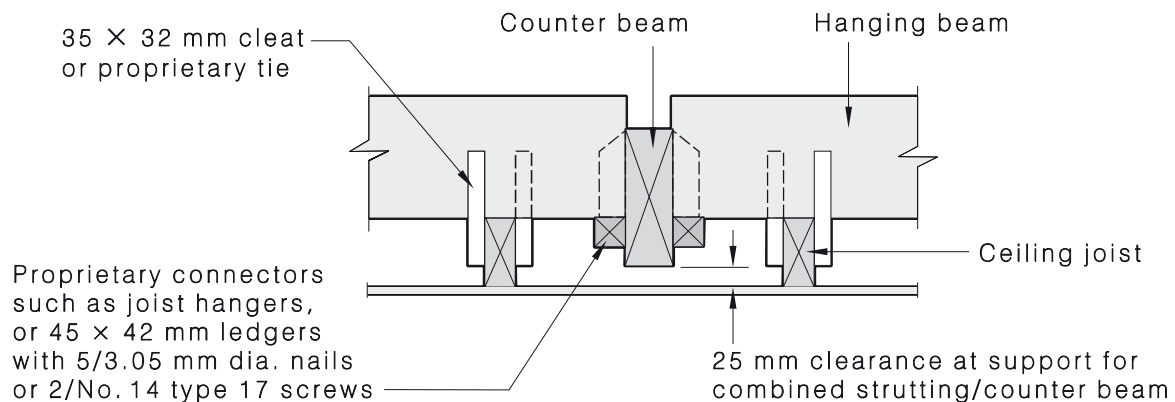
FIXING HANGING BEAM TO COUNTER BEAM
